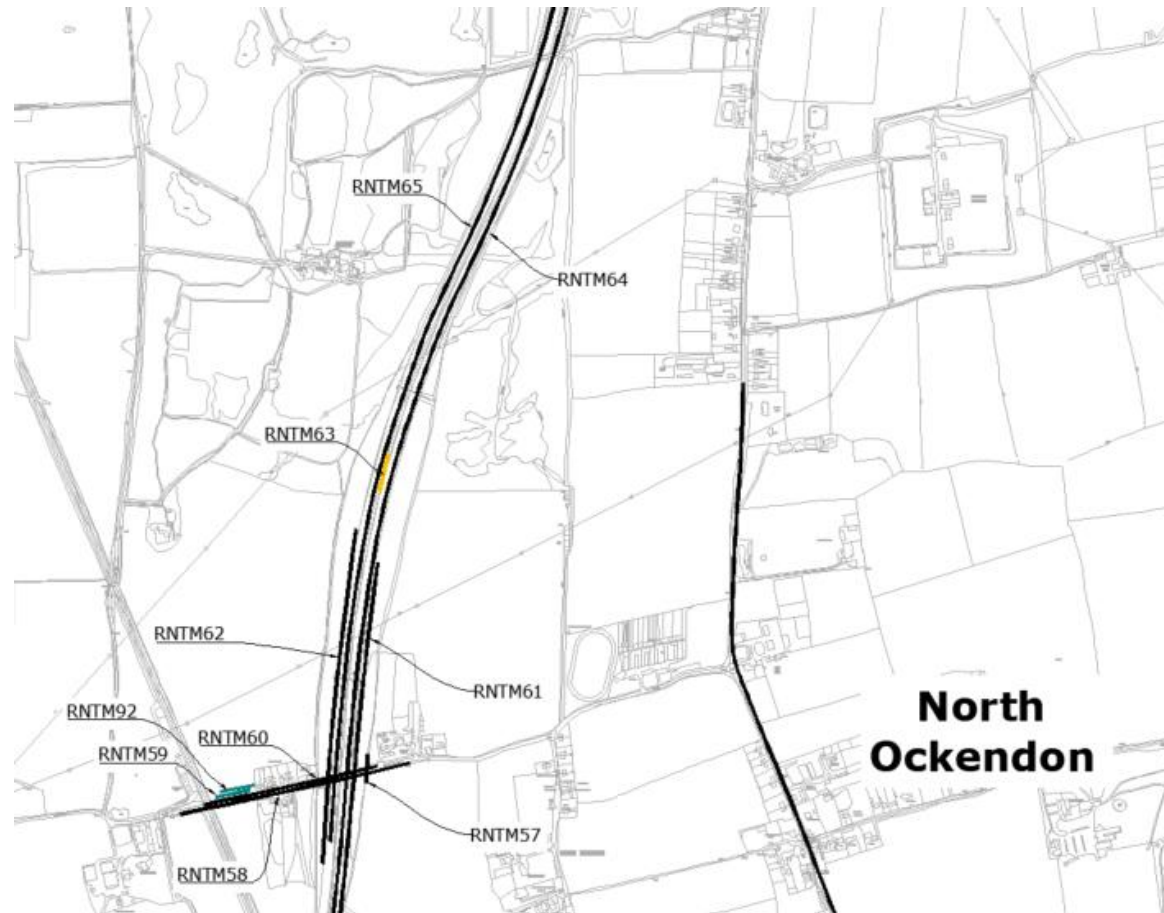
Roads North traffic management measures location plan (7 of 7)
